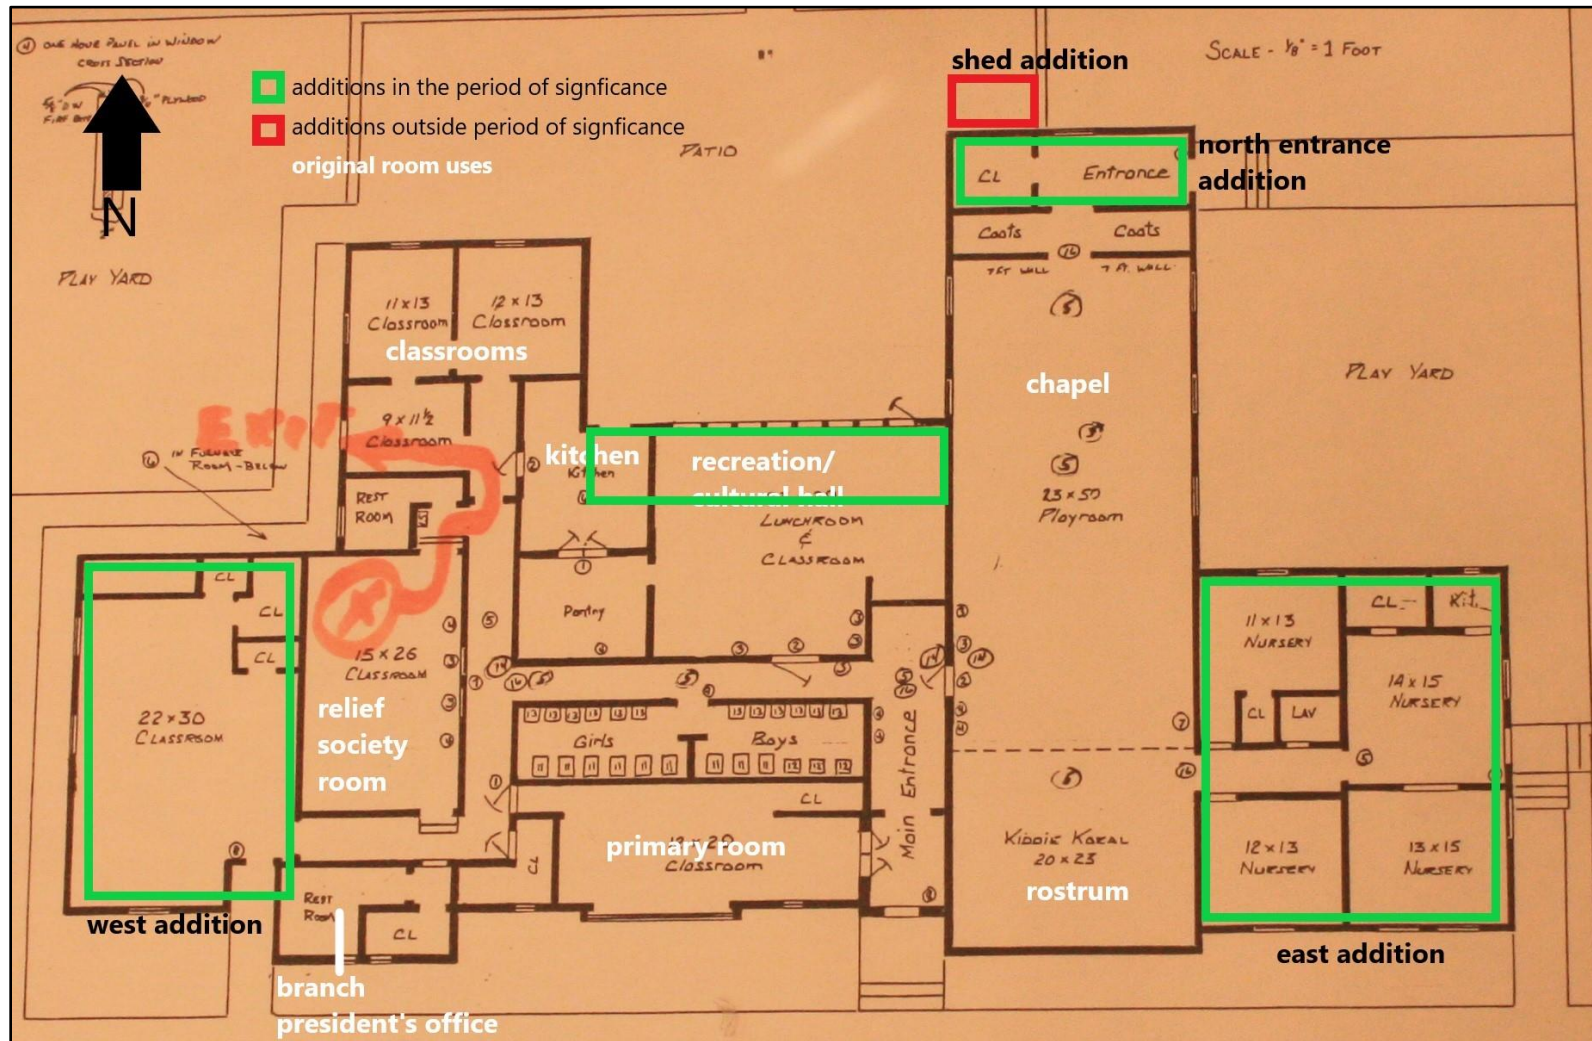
Floor plan of the existing daycare and early education facility with additions and original room uses of the Mexican Branch/Lucero Ward (personal communication, Samuel Palfreyman, Historic Sites Curator, Church History Department, to Anne Oliver, SWCA Environmental Consultants, 2021).
